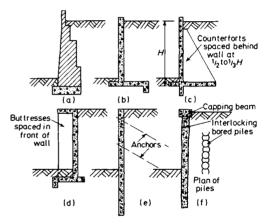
Types of retaining wall. (a) Gravity wall; (b) cantilever wall; (c) counterfort wall; (d) buttressed wall; (e) tied-back diaphragm wall; (f) cantilevered wall contiguous bored pile wall
